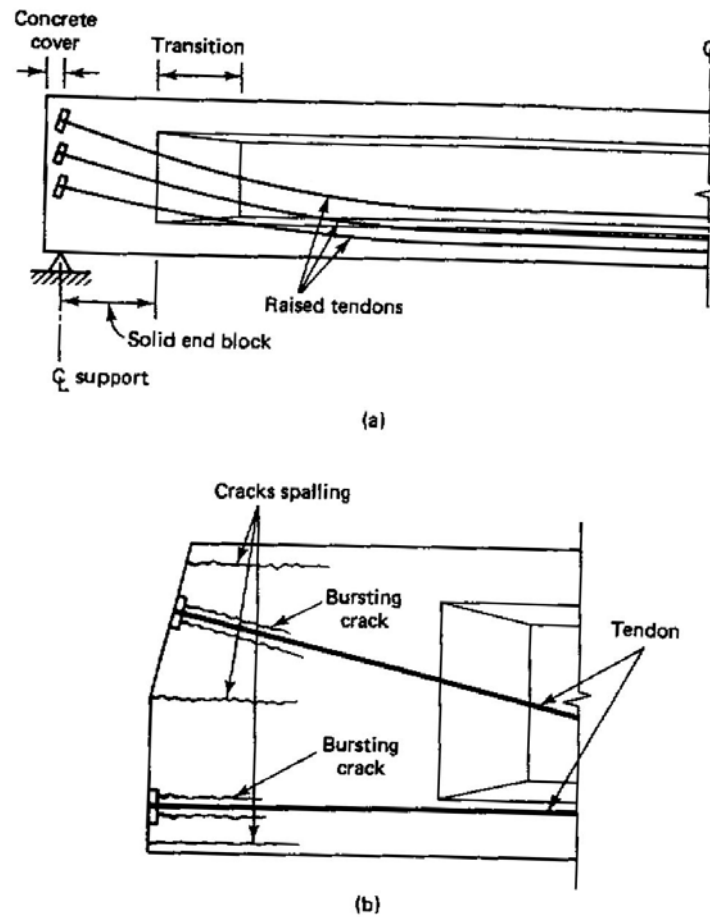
End anchorage zones for bonded tendons. (a) Transition to solid section at support. (b) End-zone bursting and spalling cracks.
